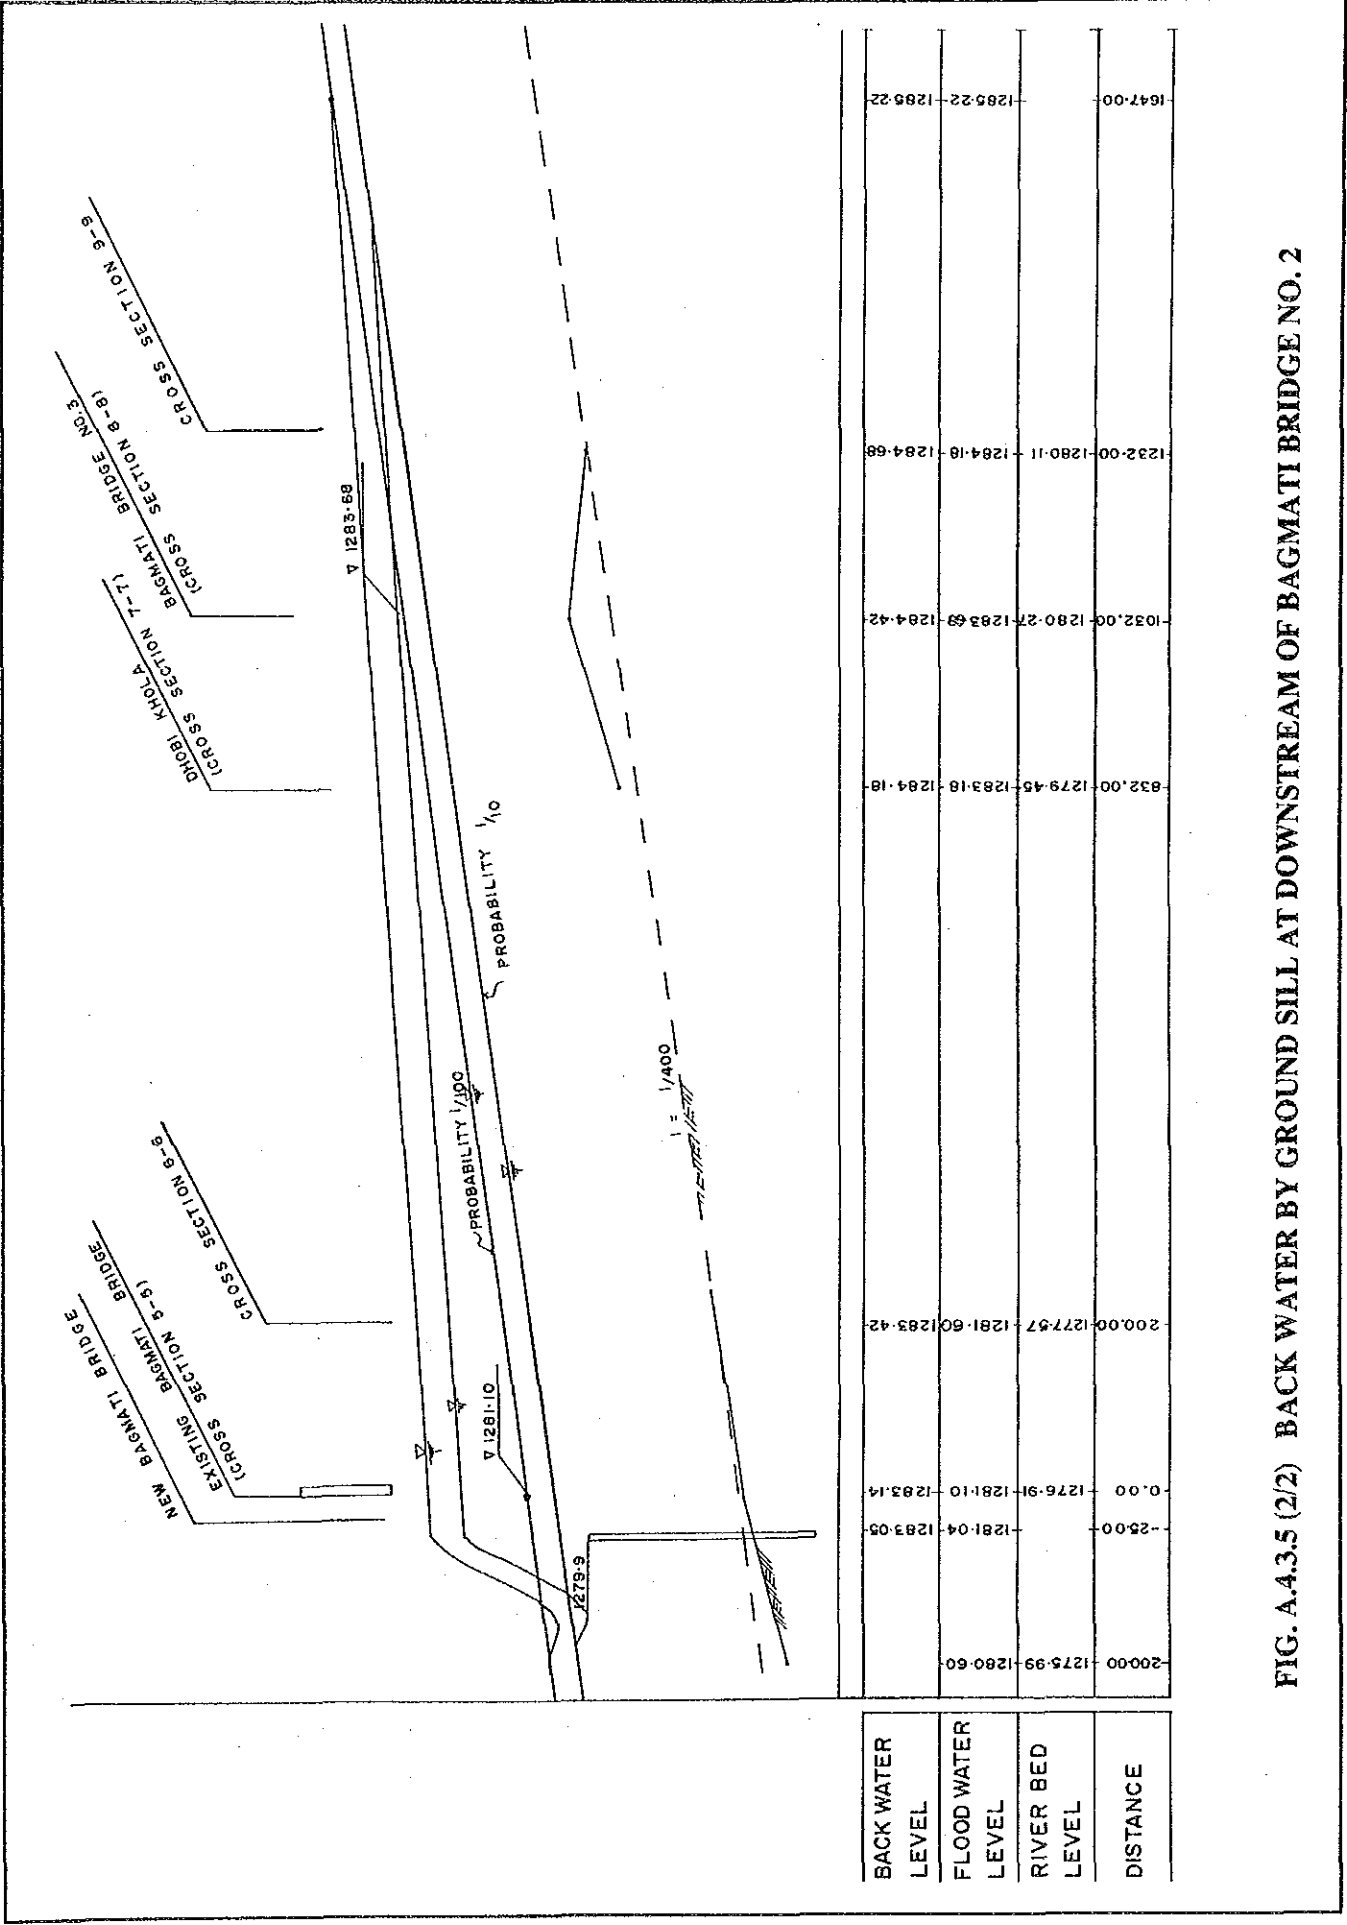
(2/2) BACK WATER BY GROUND SILL AT DOWNSTREAM OF BAGMATI BRIDGE NO. 2
